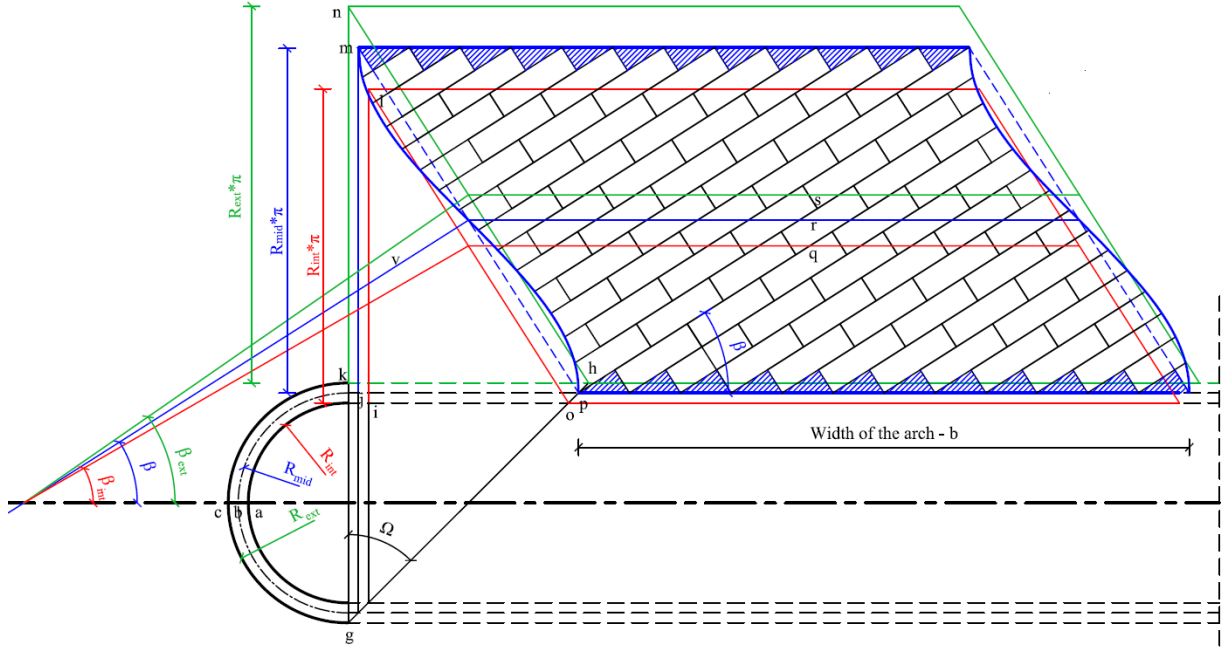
Charles Fox's drawing type design method to construct the developed surfaces.
